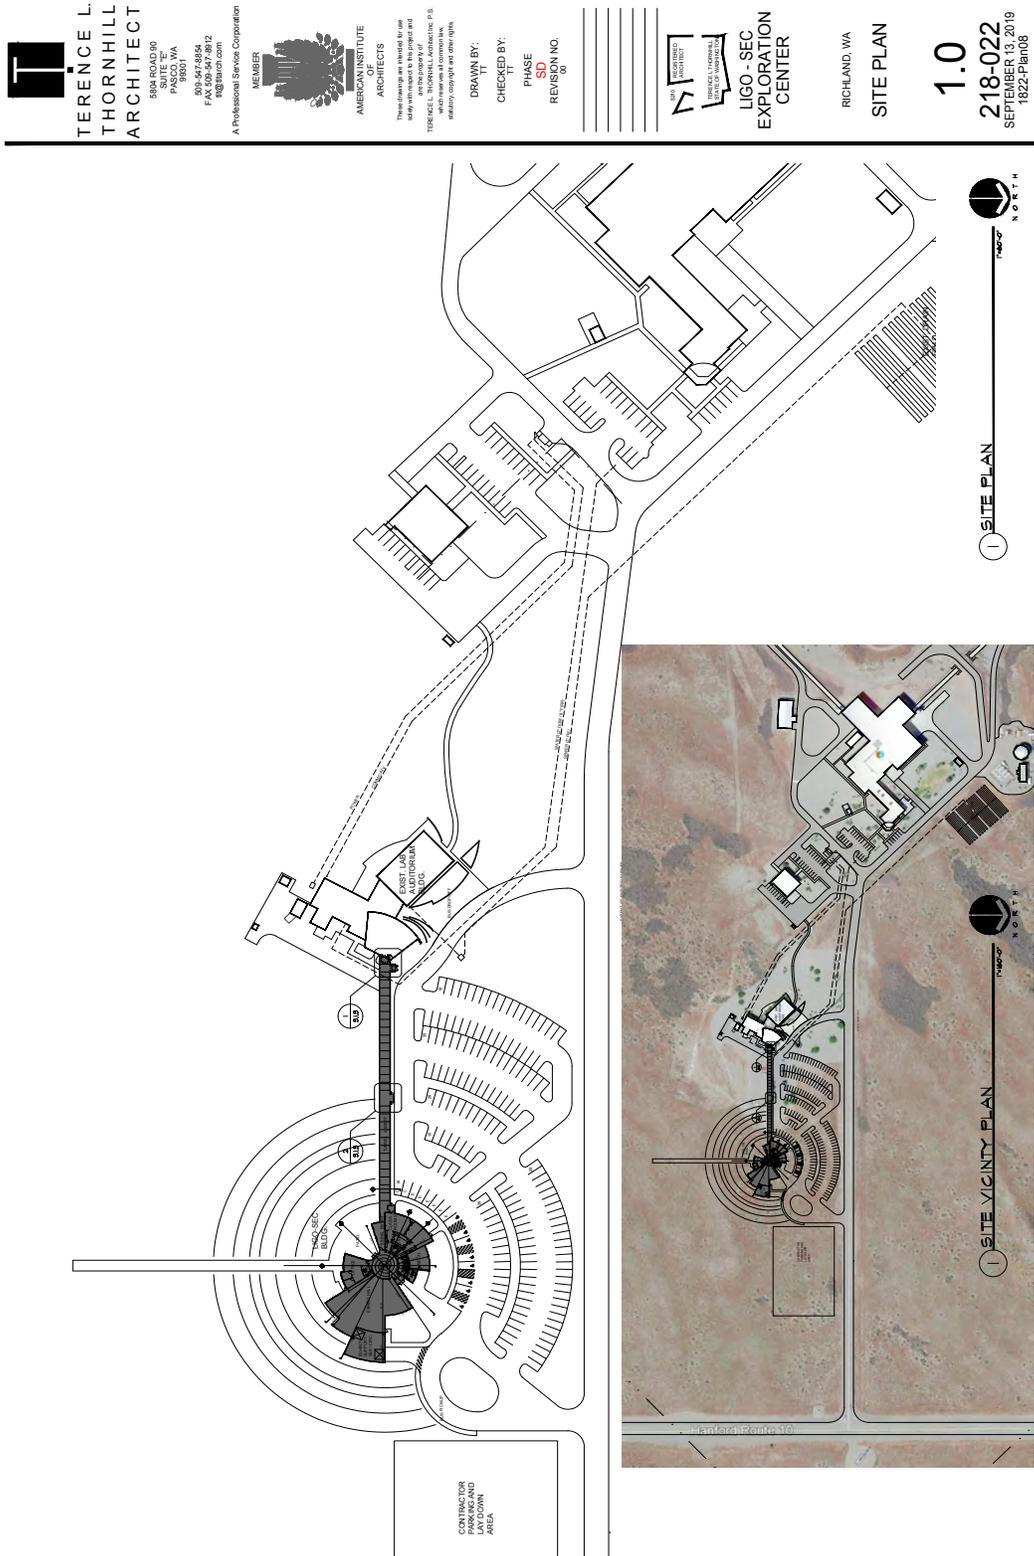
LExC plan view showing neighboring (existing) LSB building.
